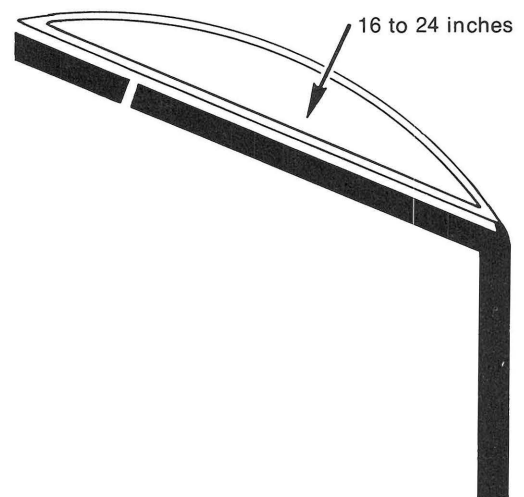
A.7. Typical maximum bubble height will be from 16 inches to 24 inches.
